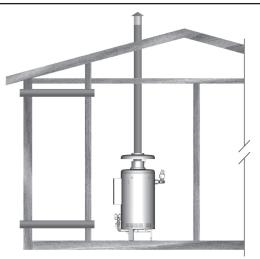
OUTDOOR AIR THROUGH TWO HORIZONTAL DUCTS
